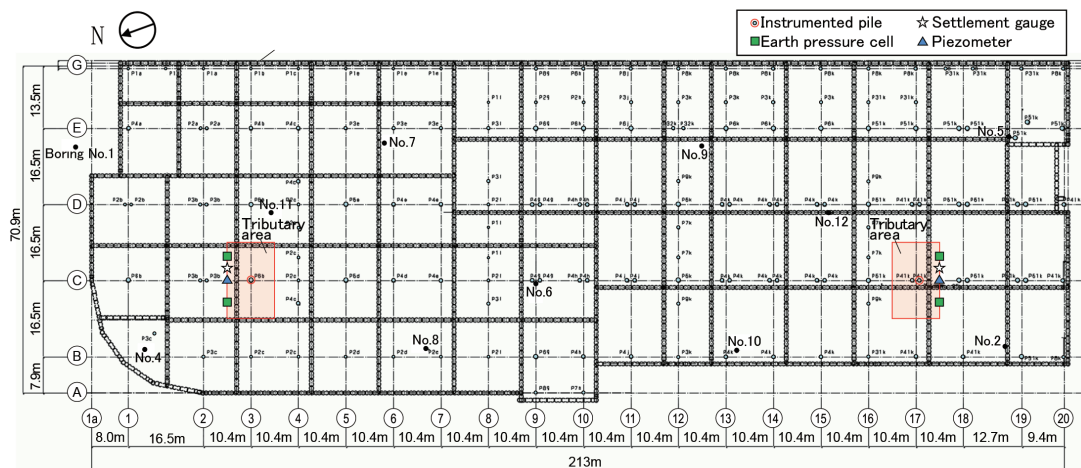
Building and foundation with monitoring equipment locations: foundation plan view
